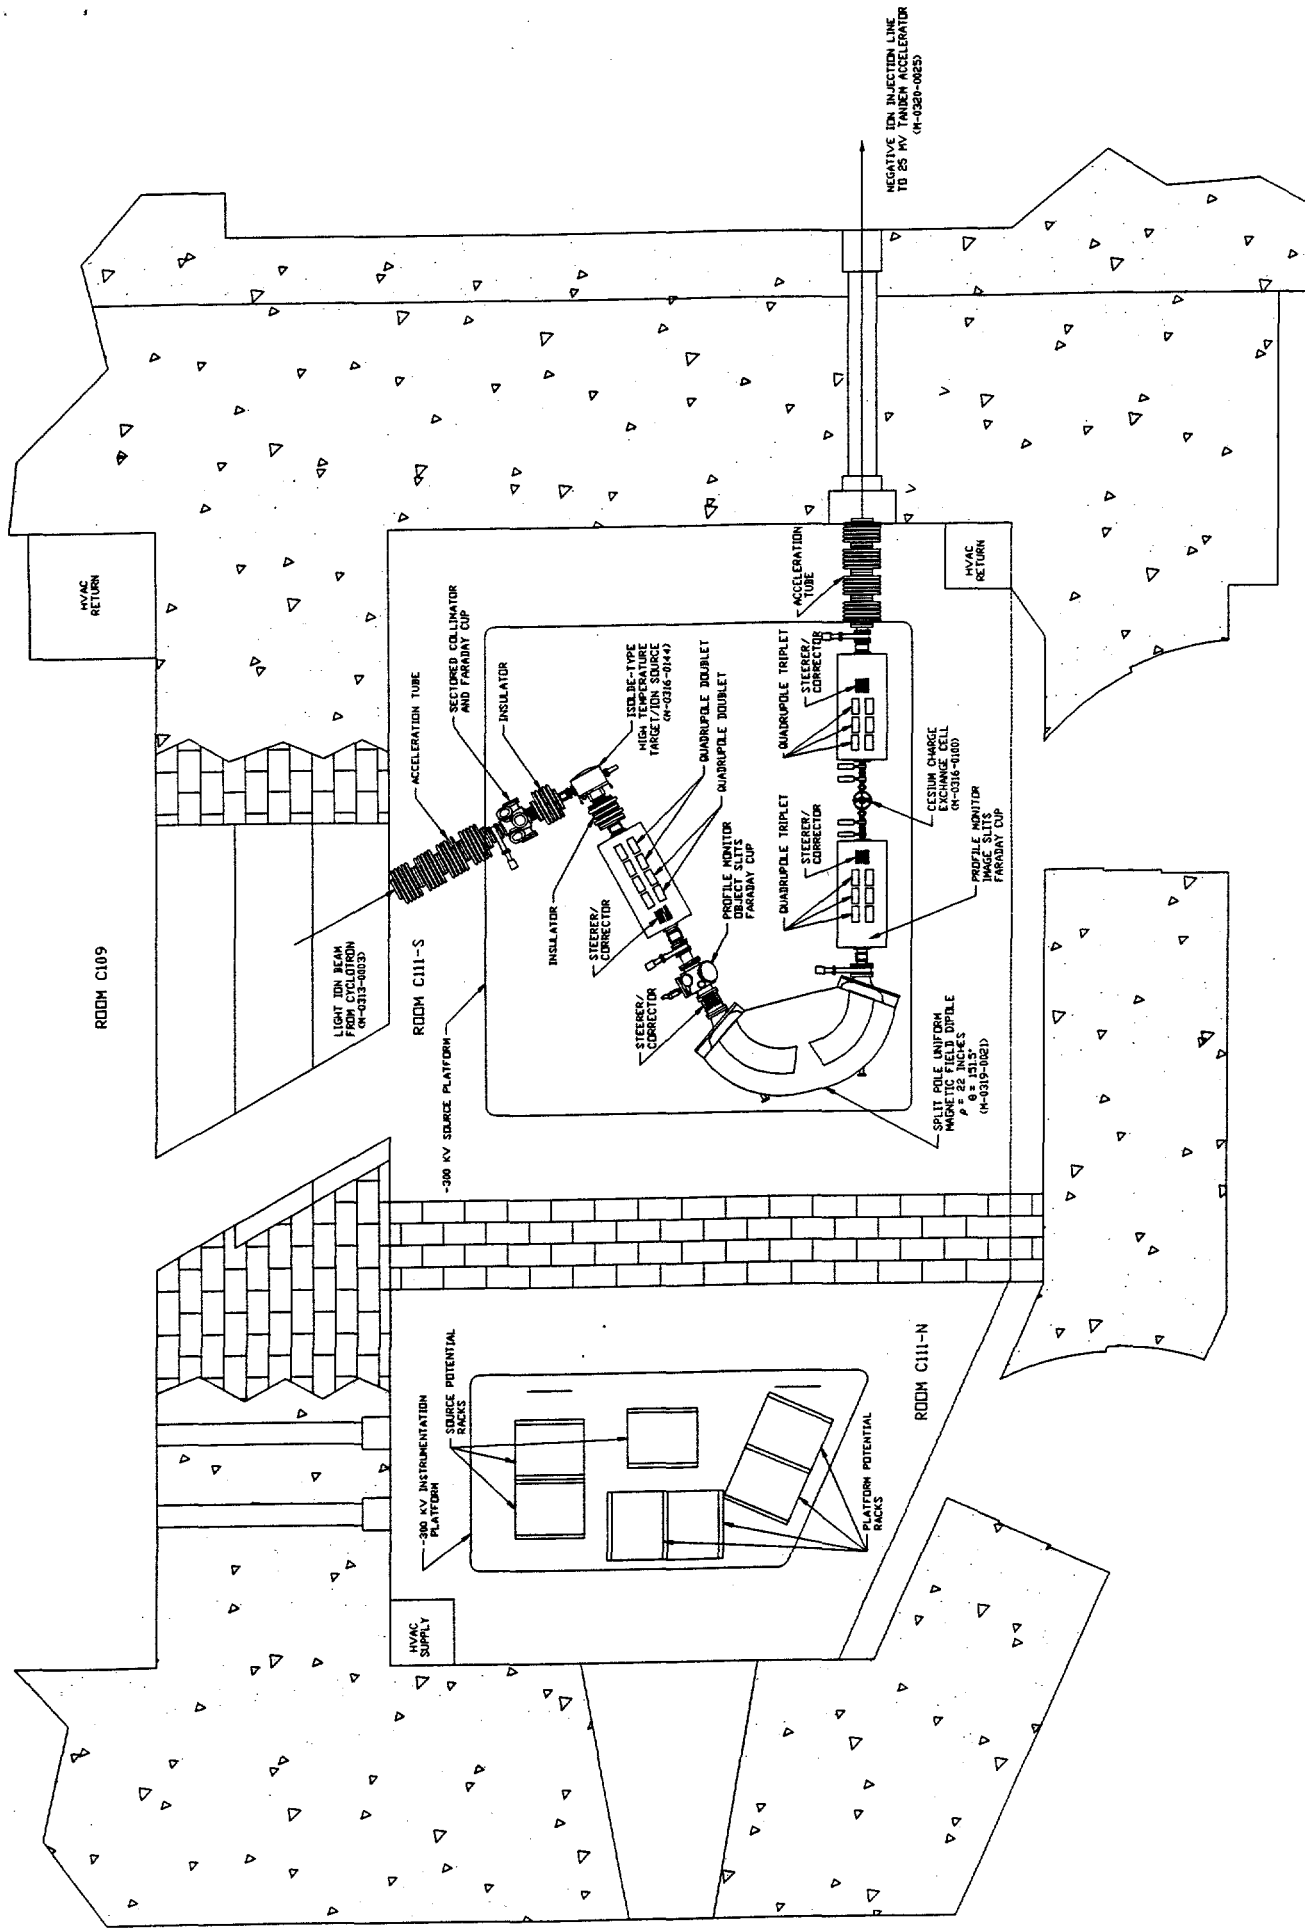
High-voltage platform system floor plan showing the source platform, instrumentation platform, shielding wall, high-voltage conduits, and instrumentation racks.
